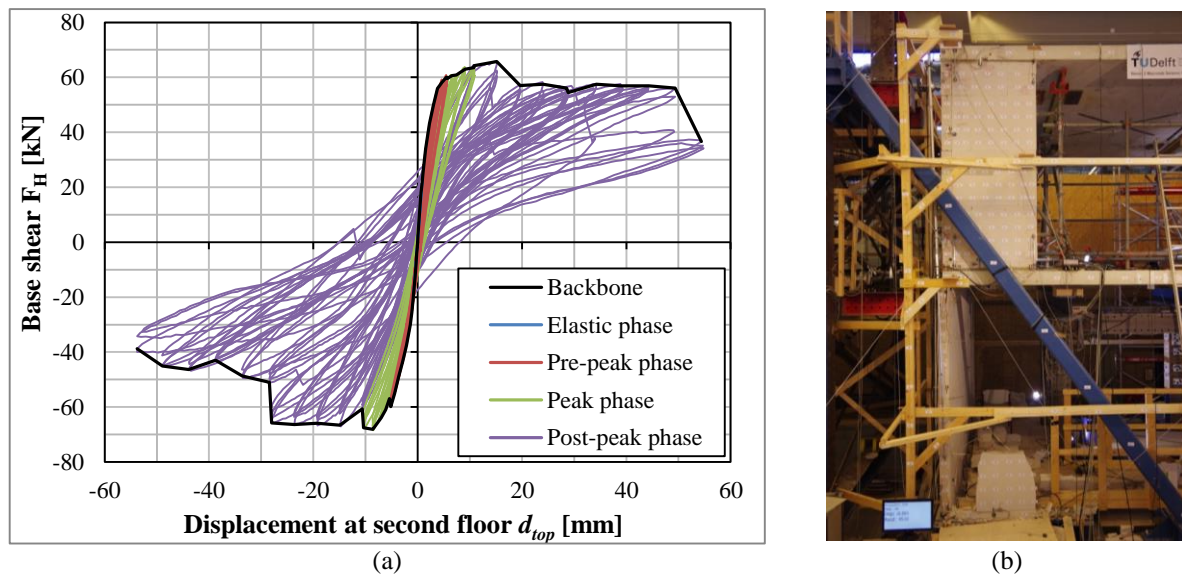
Base shear vs. top displacement (capacity curve) of the tested structure (a), and detail of the structure after the failure of the long piers of ground floor (b)
